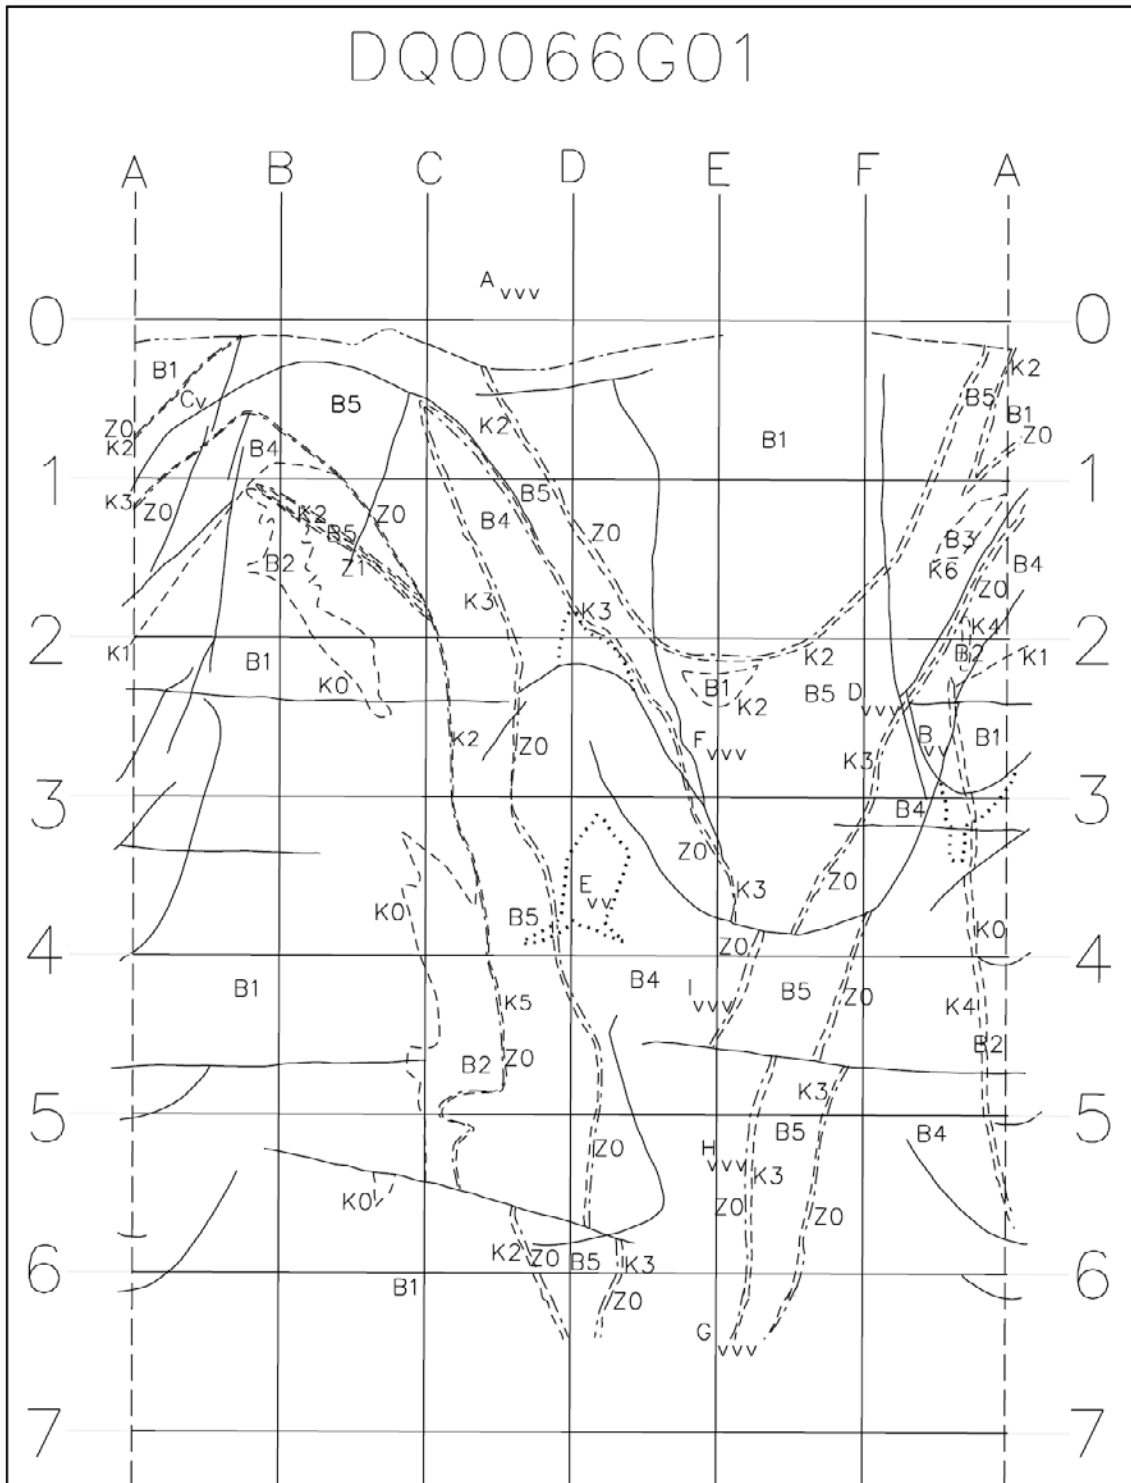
The A-wall, the left wall when one is looking towards tunnel front (face).
